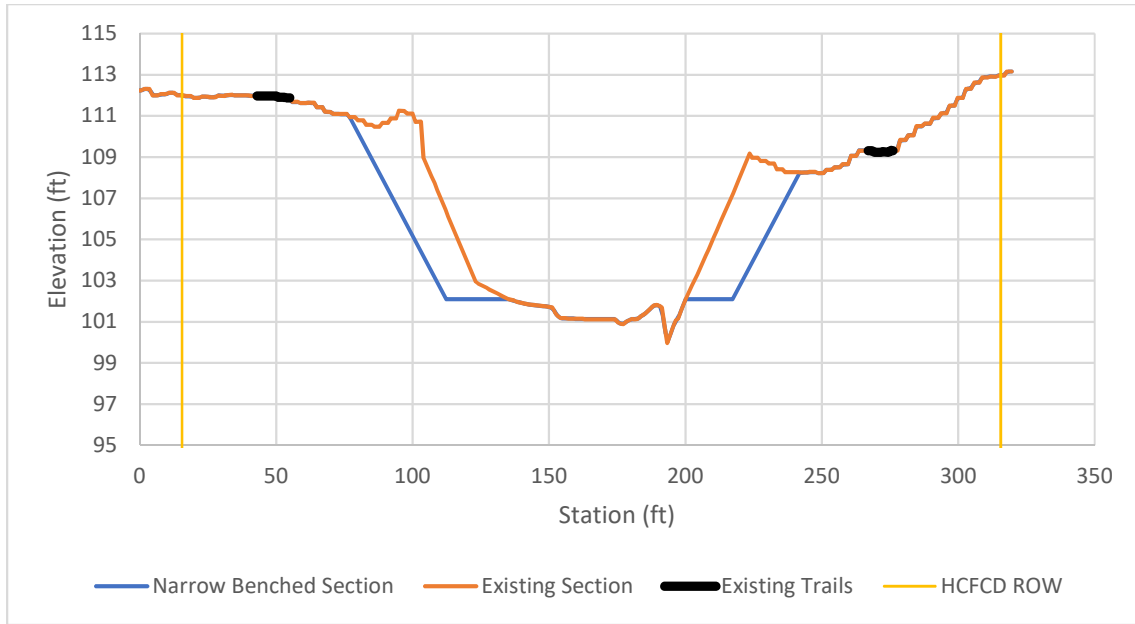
Typical Channel Improvement Section for Alternative 1, Scenario 1C
